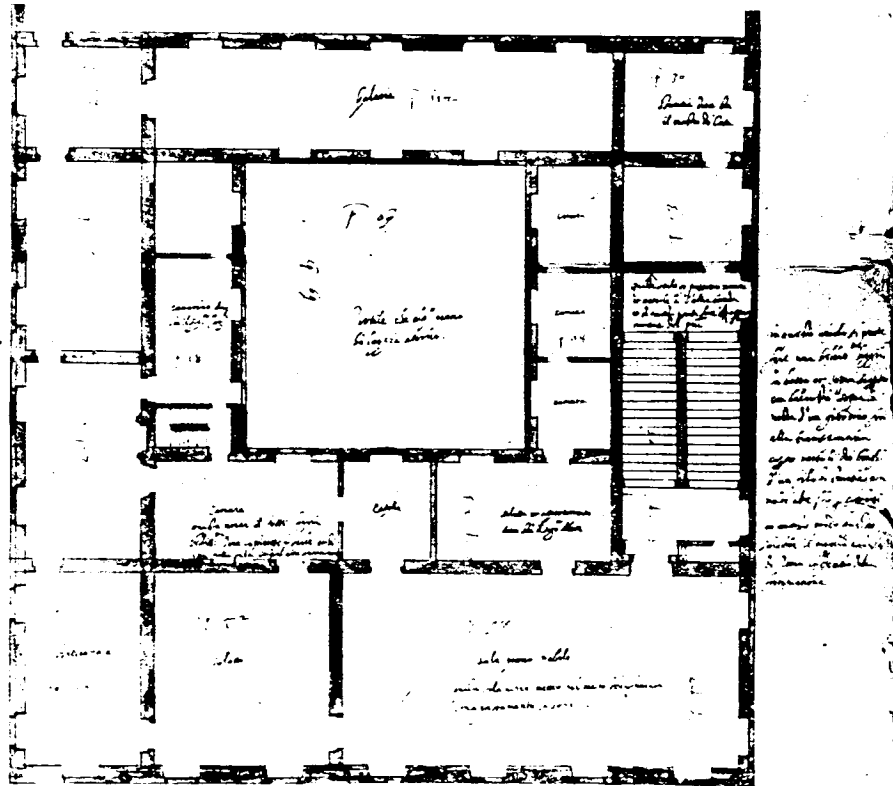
Palazzo Castellesi: ground floor plan (Codice Coner, f. 8. London, Soane Museum)
